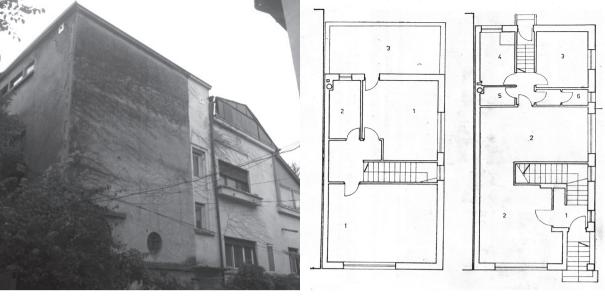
(opposite page) "Square house" [a - perspective, b - ground floor and first floor plans]. Author: arch. Florea Stănculescu Fig. 11. (above) Felix Stănculescu House: [present street view, b - floor plans]. Author: arch. Florea Stănculescu
